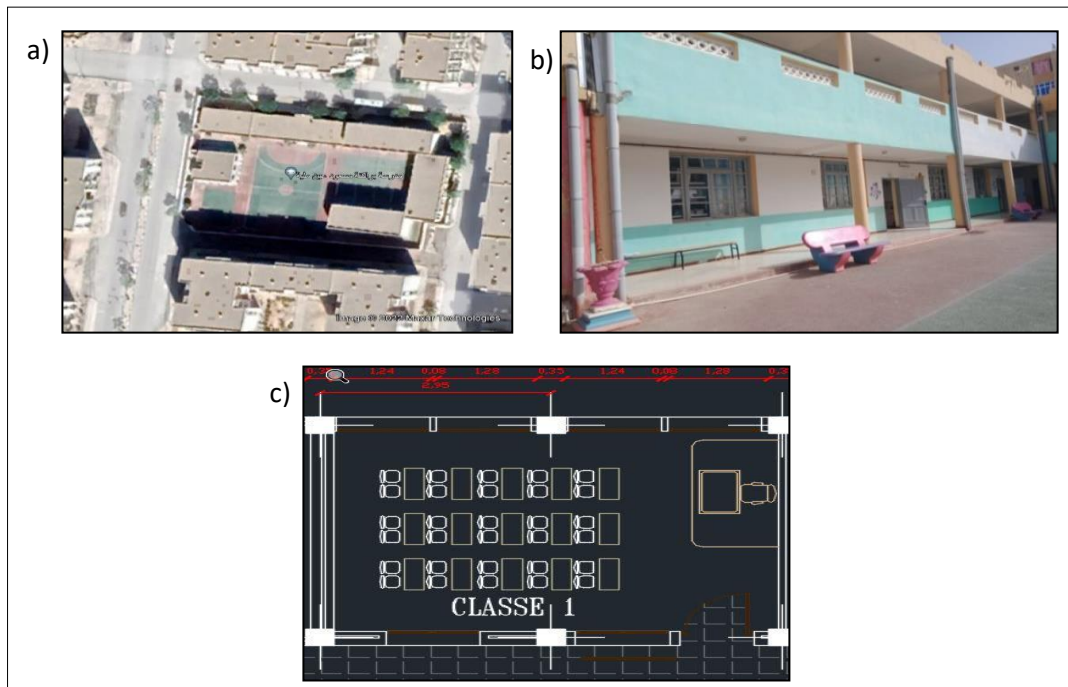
a) Case site b) detailed information on the school building c) classroom layout
